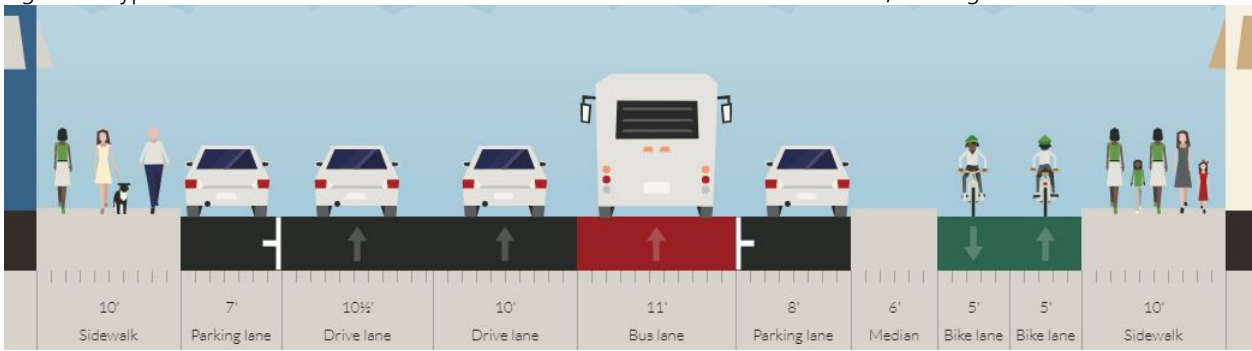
Typical Cross Section of Folsom Street between 5th Street and between 5th and 4th streets
